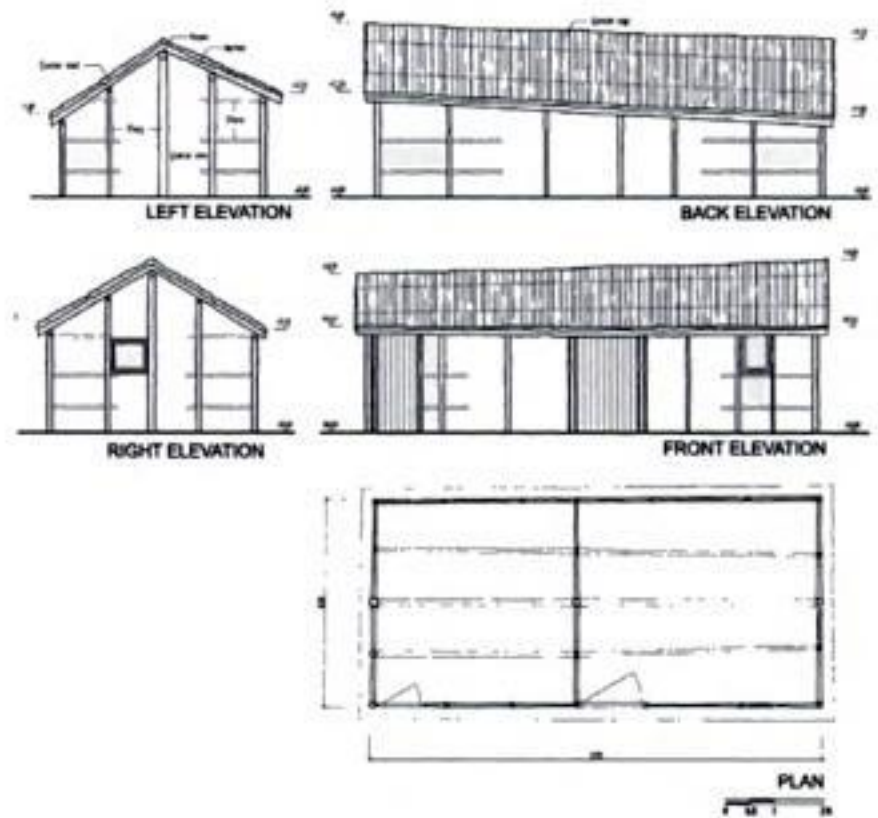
The Huğ House next to Mersin Yumuktepe Tumulus. This house is the only registered example. (plan, section, elevation).
